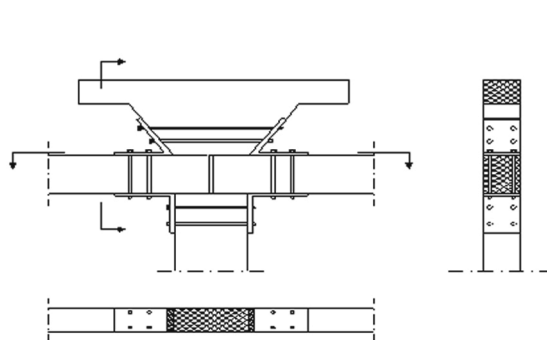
Beam-to-column and beam-to-beam steel connections for precast r.c. buildings.
